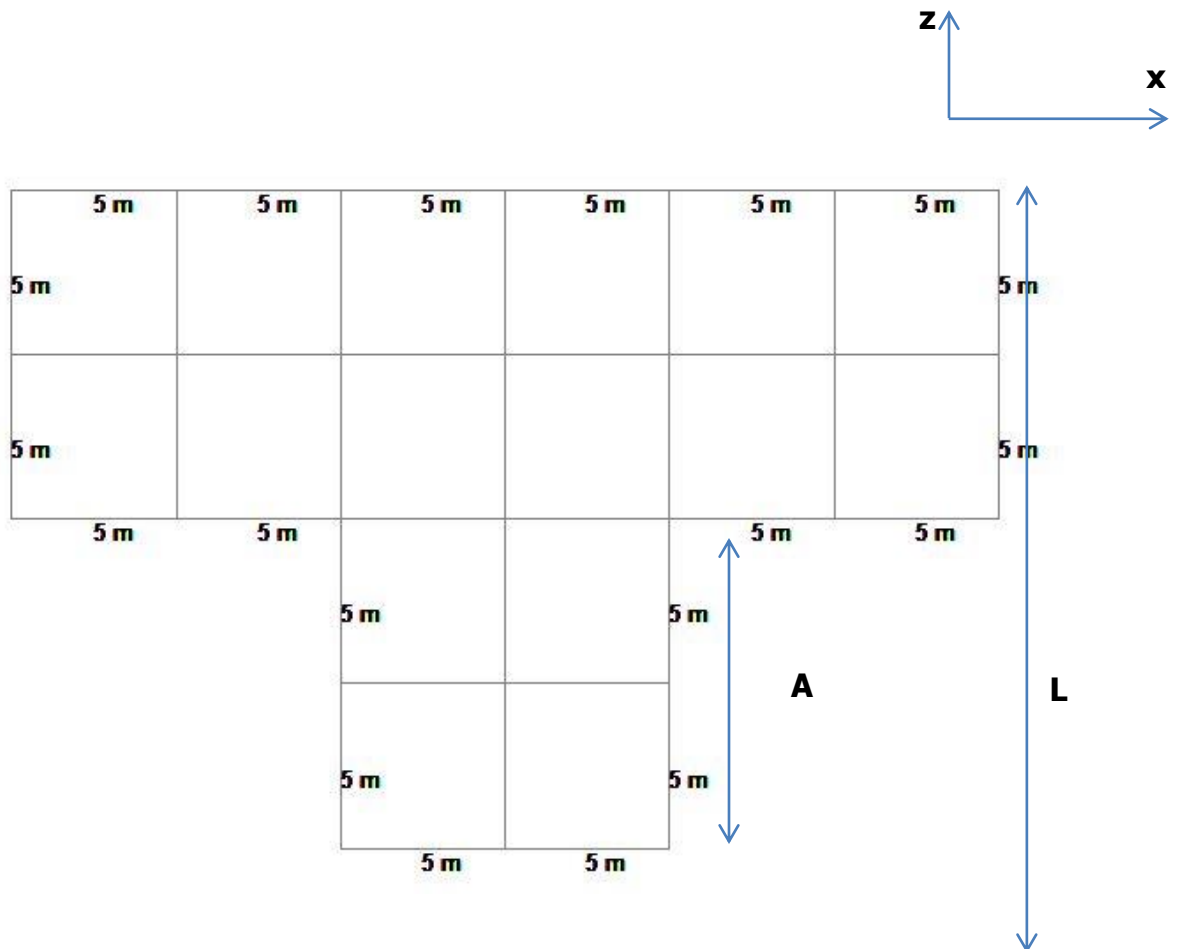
Plan of T shaped Re-entrant corner Structure(12 Storeys)
